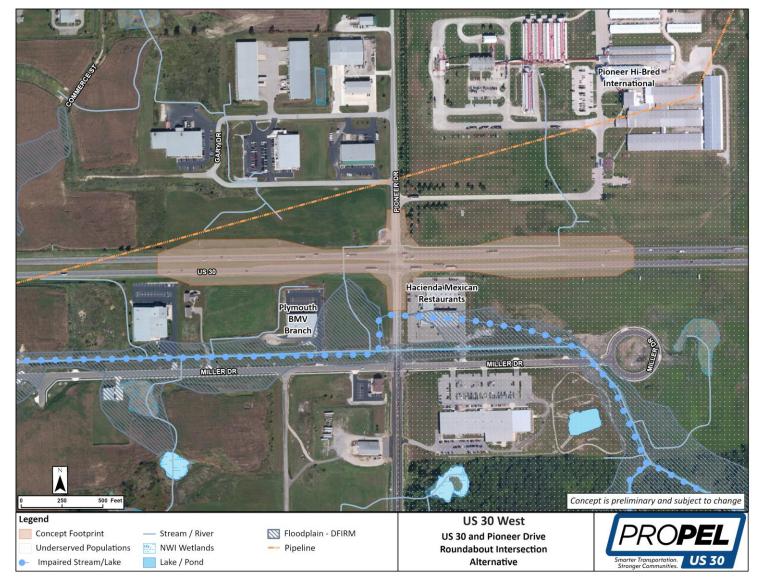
US 30 and Pioneer Road – Roundabout Alternative
